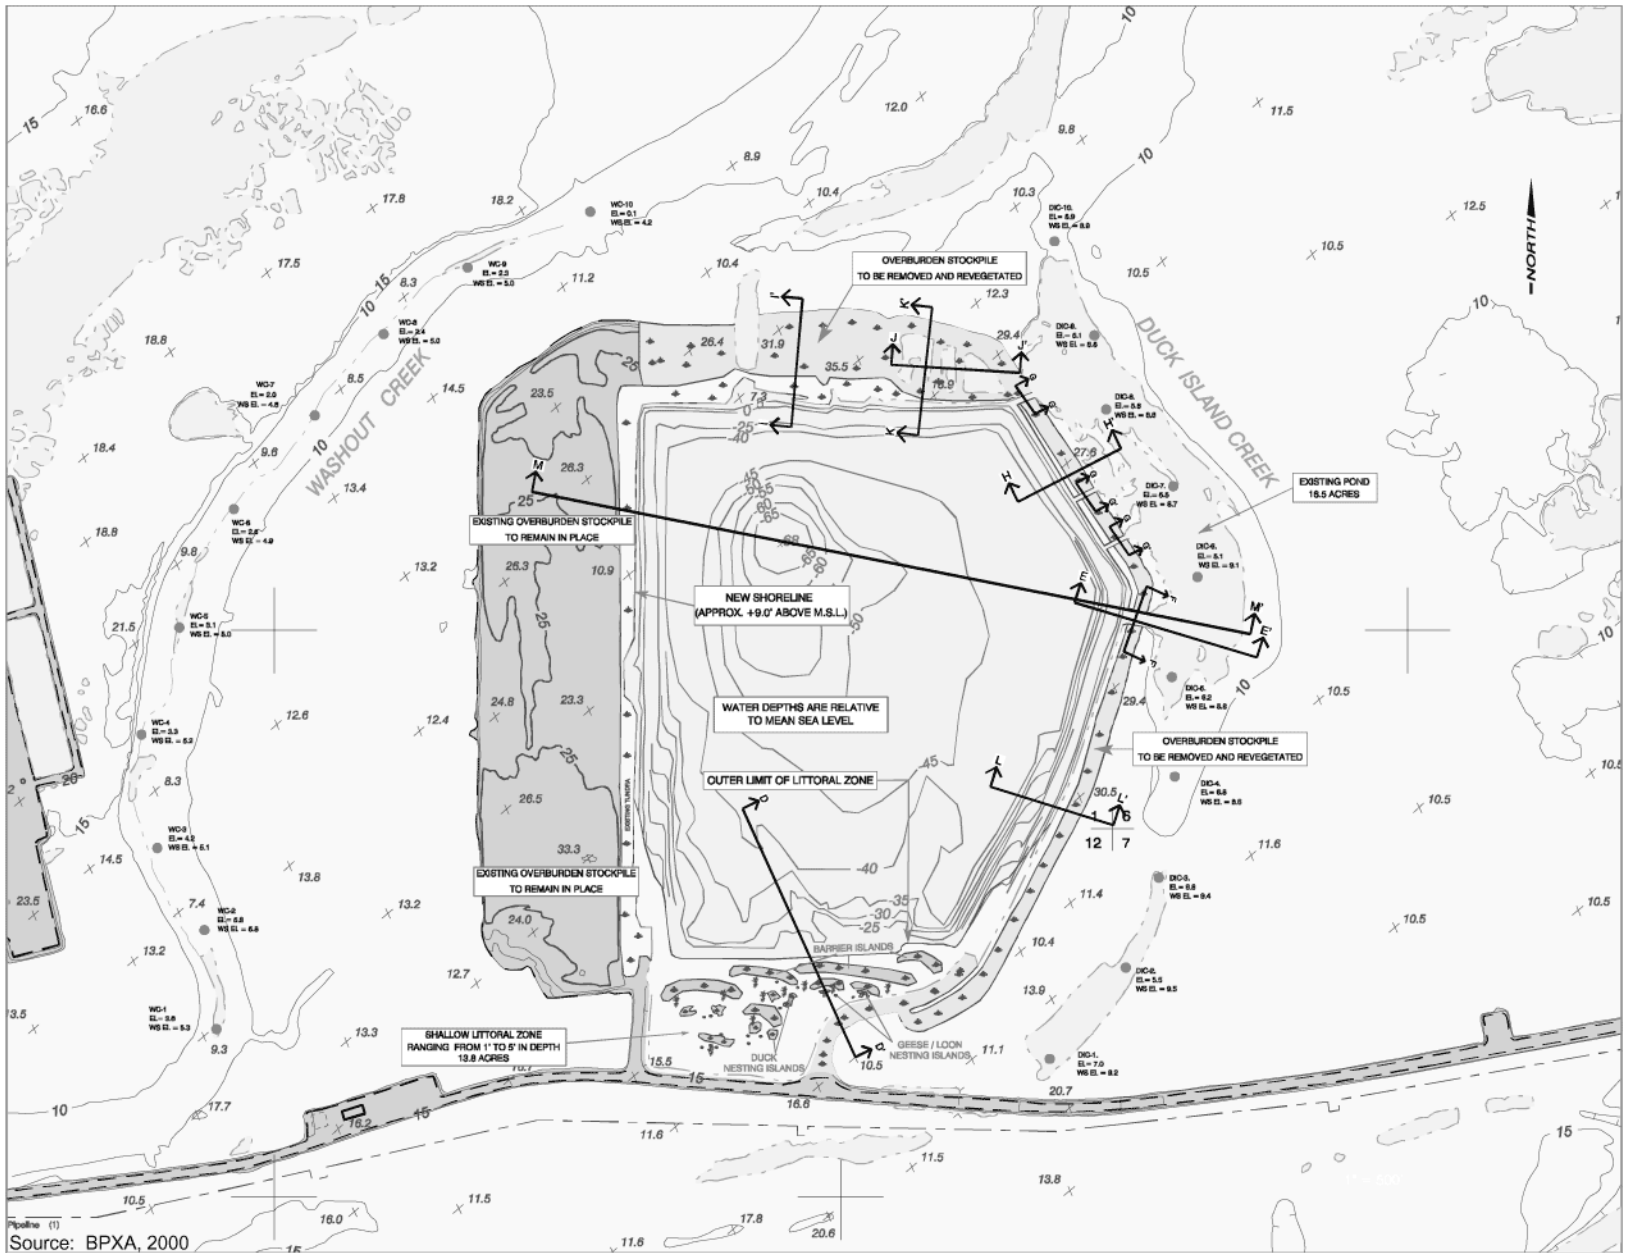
Duck Island Mine Site - Proposed Restoration - Plan View
